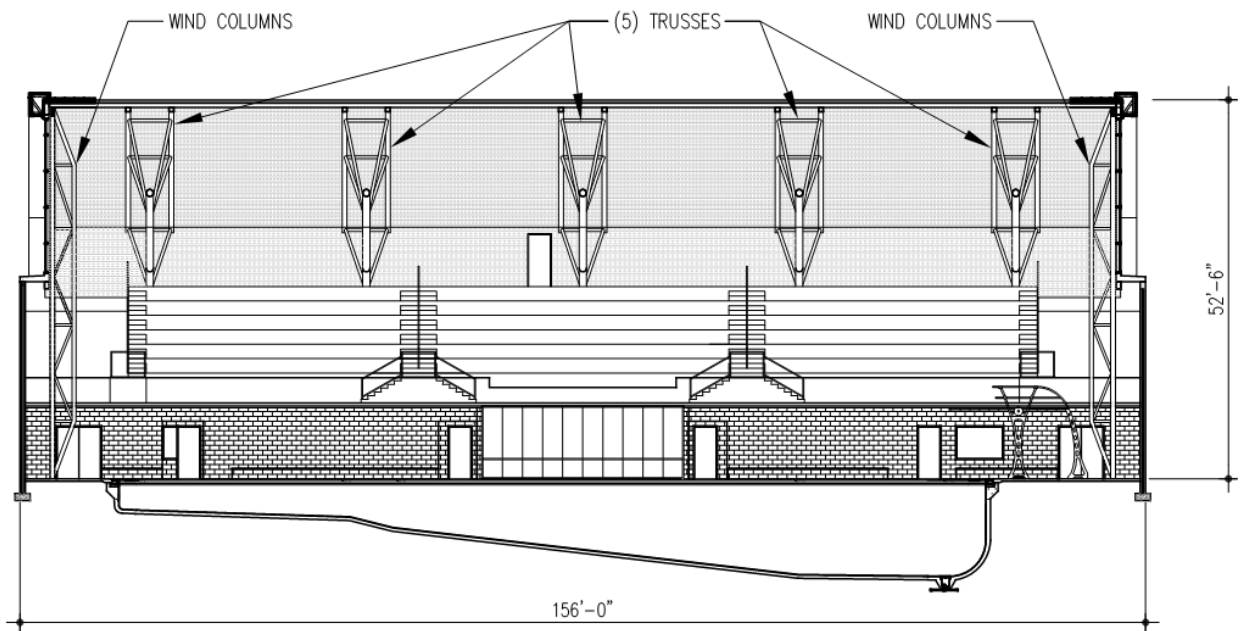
Cross Section Through Indoor Pool Area Showing the Wind Columns (Looking East)
